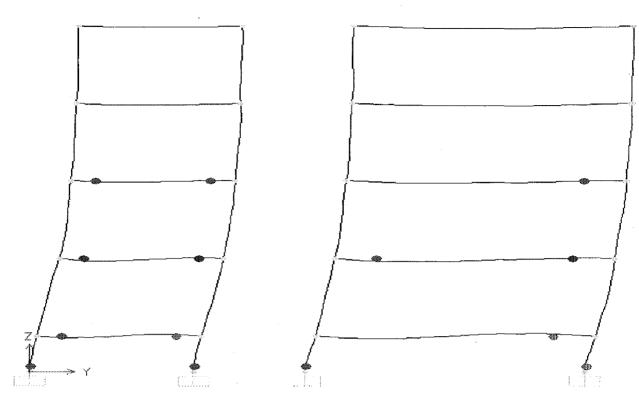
Yield Pattern at Ultimate Point for Bare Frame Building Designed for Gravity in Transverse Direction
